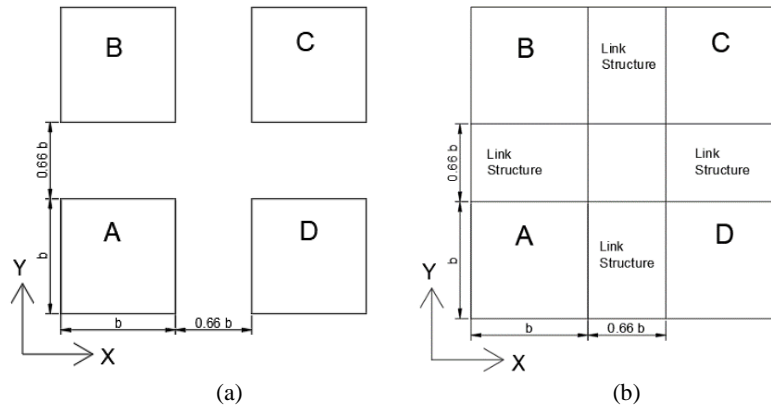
(a) Four separate buildings (b) Four buildings connected by link structure.
